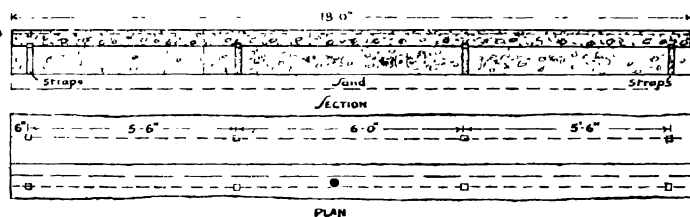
Method of Strengthening Transverse Joints by Transverse V-shaped Reinforced Beams.
